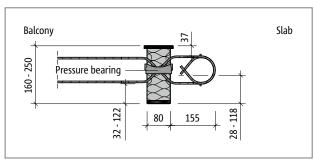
Schöck Isokorb® T type Q-E-W-VV1 up to VV3: Product section
